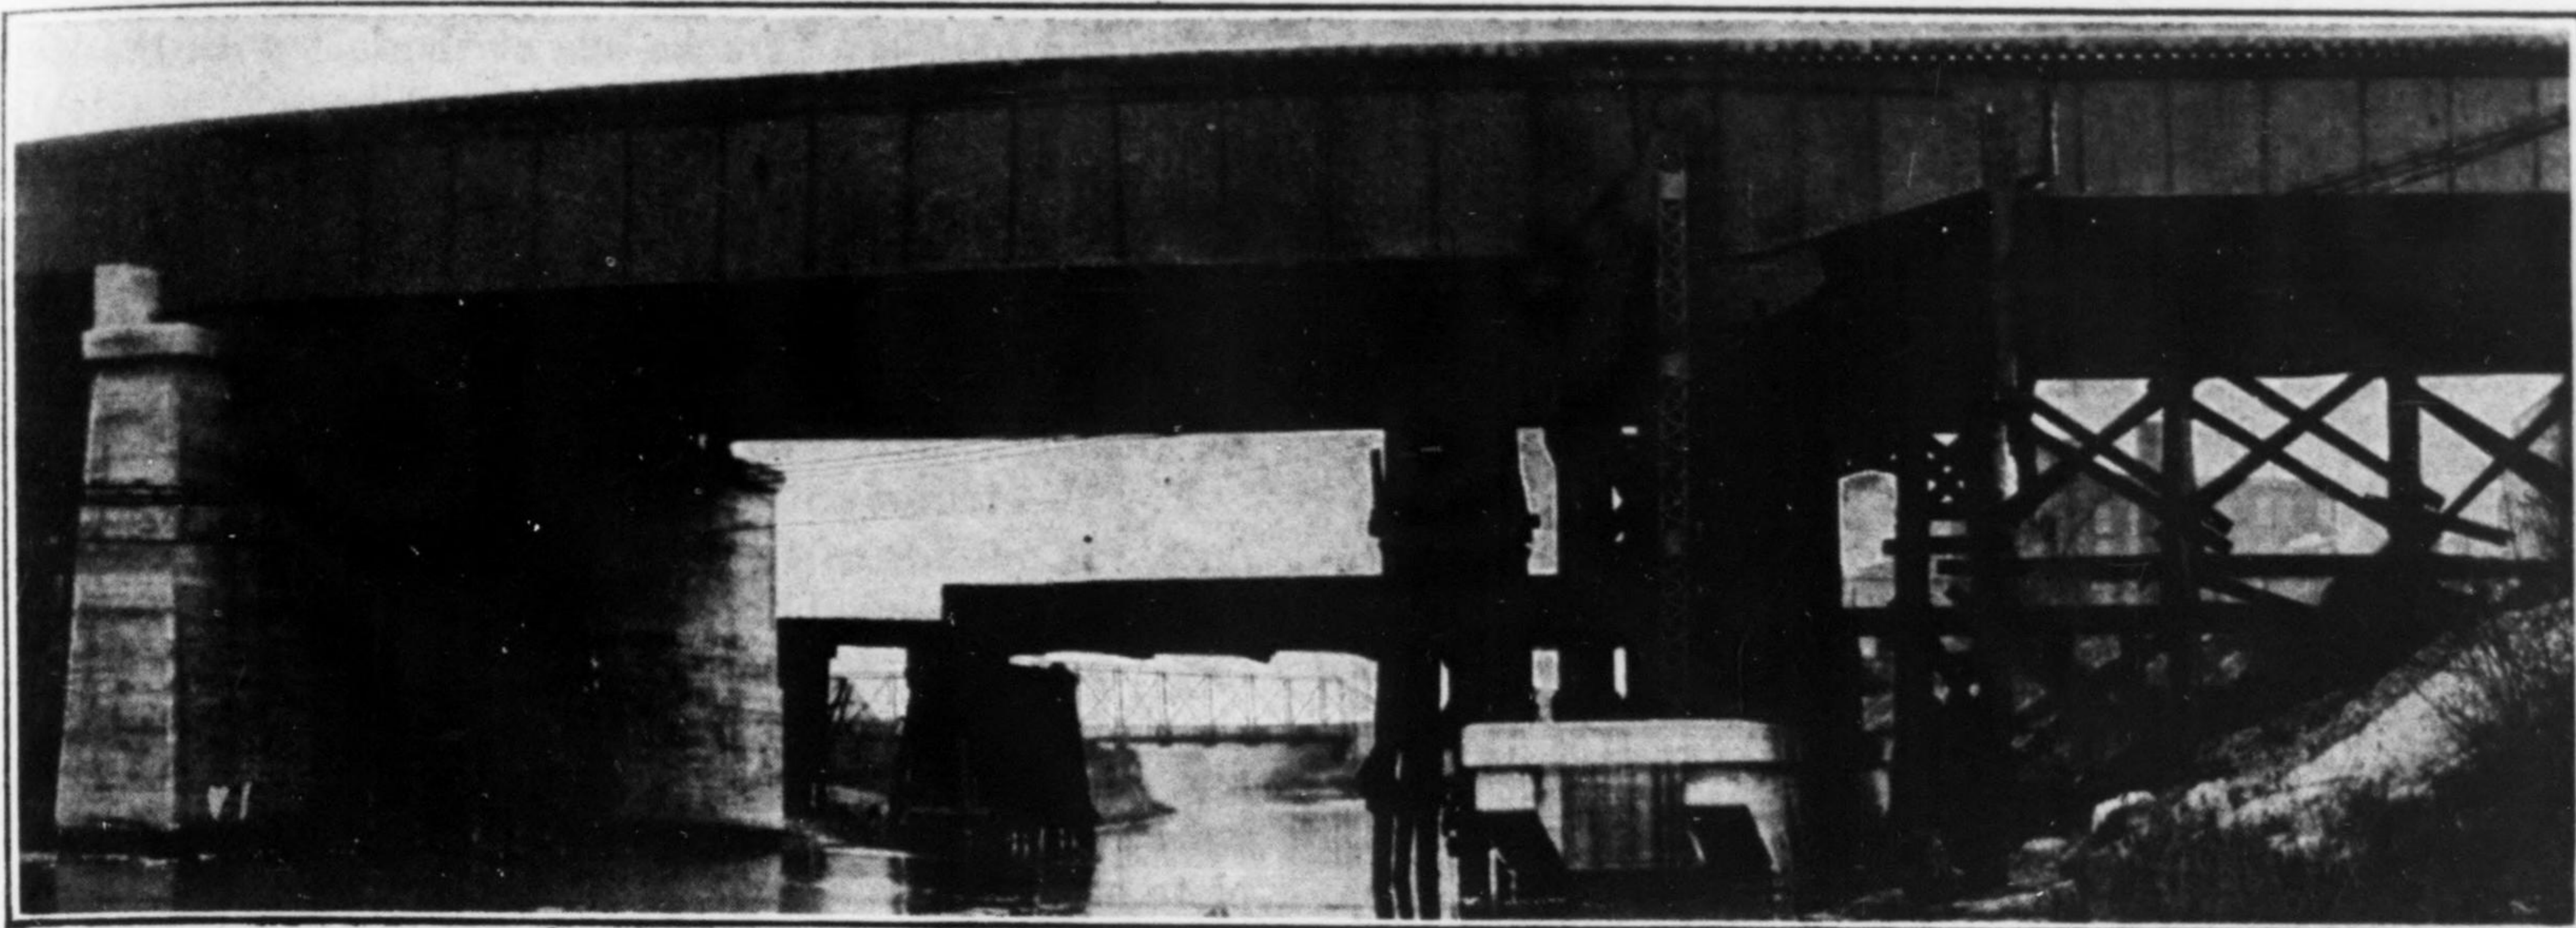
DECK-GIRDER SIX-TRACK BASCULE BRIDGE
